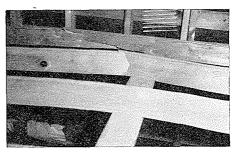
Failure of Two Collar Ties in the Attic at one End of Test House under 143 per cent of Design Snow Load.
